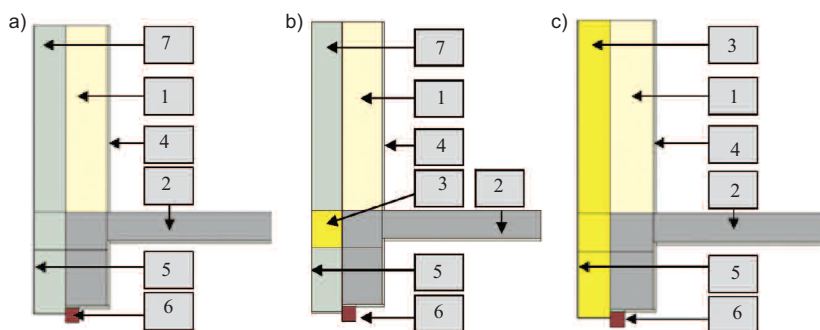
Geometric models of a monolithic wall adopted for analysis together with material characteristics: a) variant 1A – reinforced concrete wall + polystyrene; b) variant 1B – reinforced concrete wall + polystyrene + mineral wool belt; c) variant 1C – reinforced concrete wall + mineral wool
